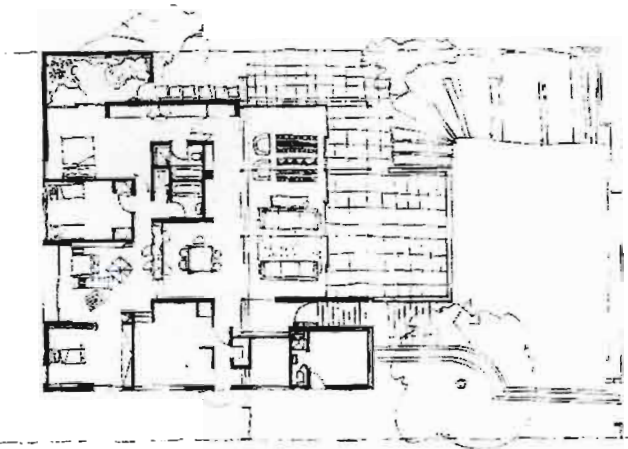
BDG - House Lazarus / Charles (1976). Plan - (NPIA Newsletter 1-1980)
